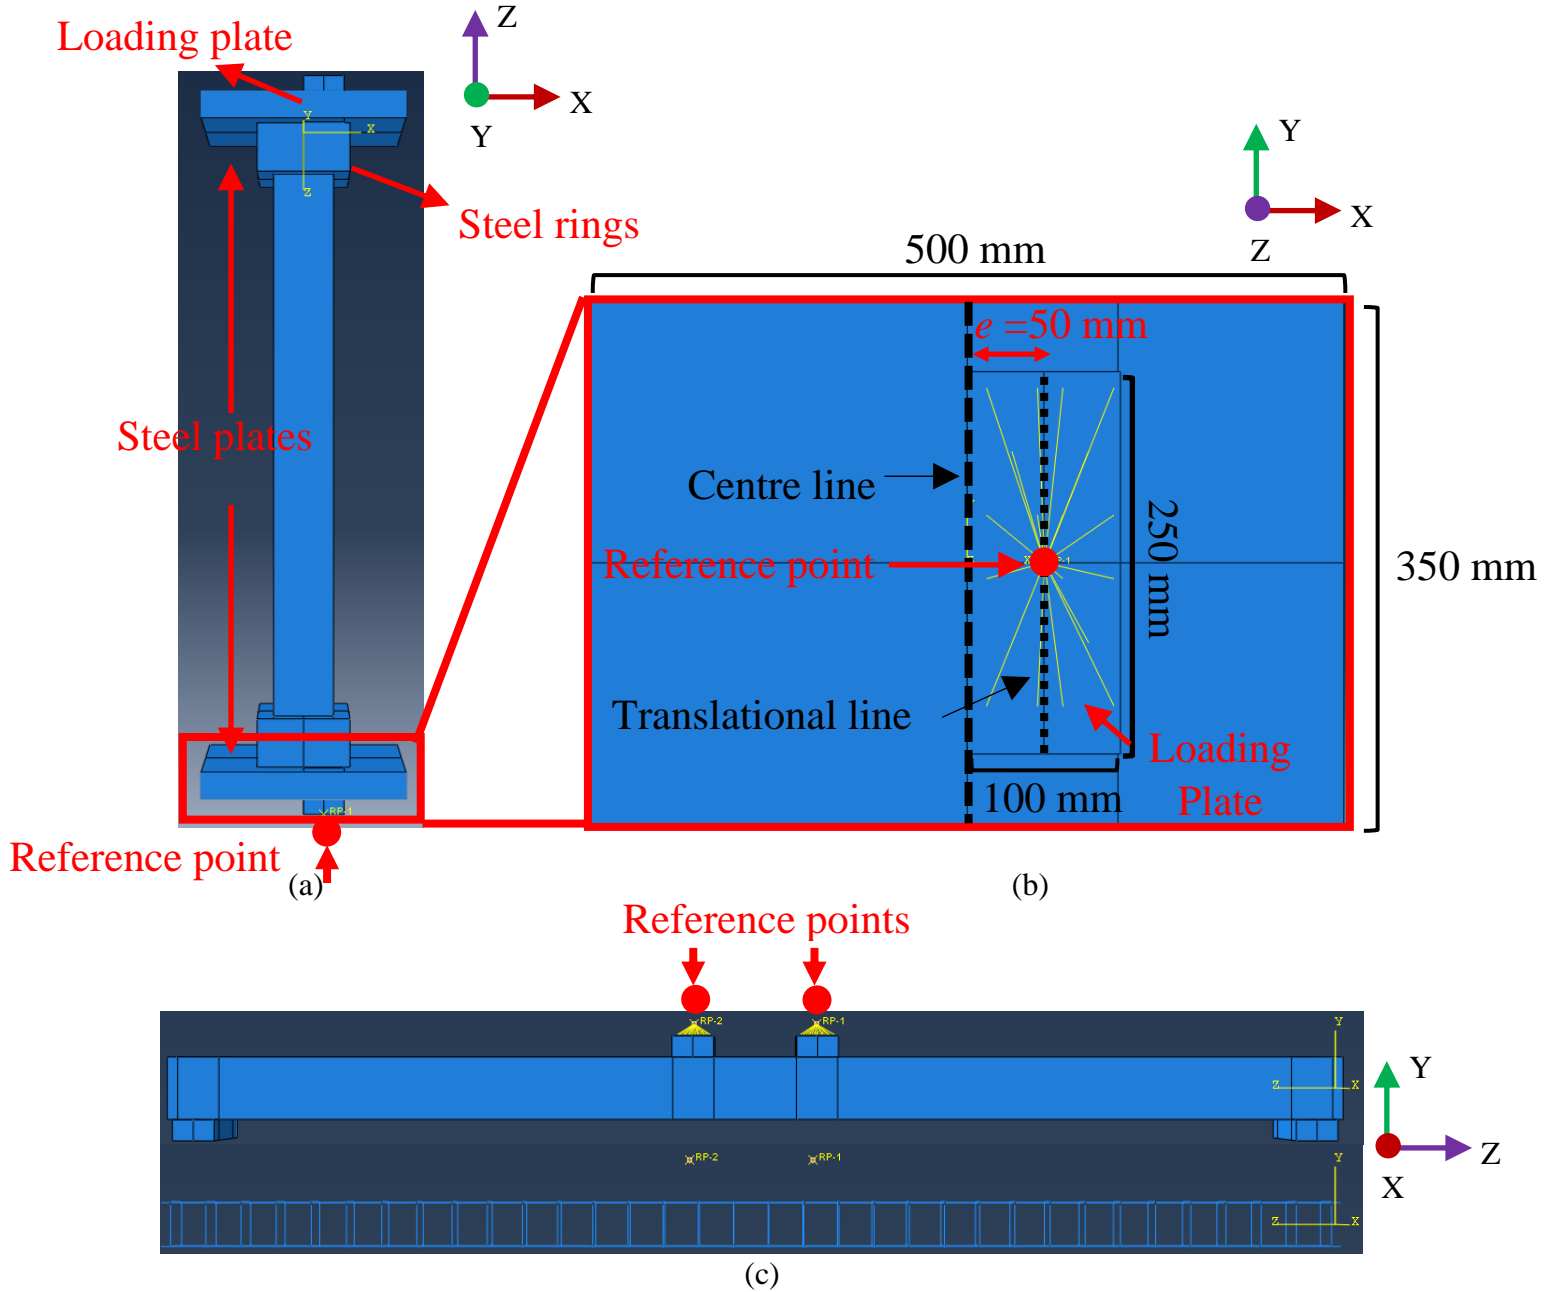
Finite element (FE) modelling for: (a)UHPFRC slender column and transverse steel arrangement; (b) Steel plate and loading plate; (c) four point bending test for UHPFRC beam.
